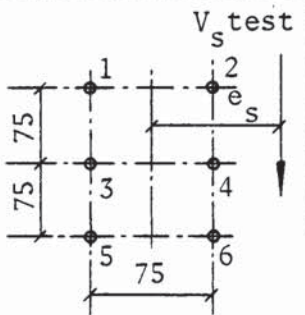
SIX HSFG BOLT TEST SPECIMEN
